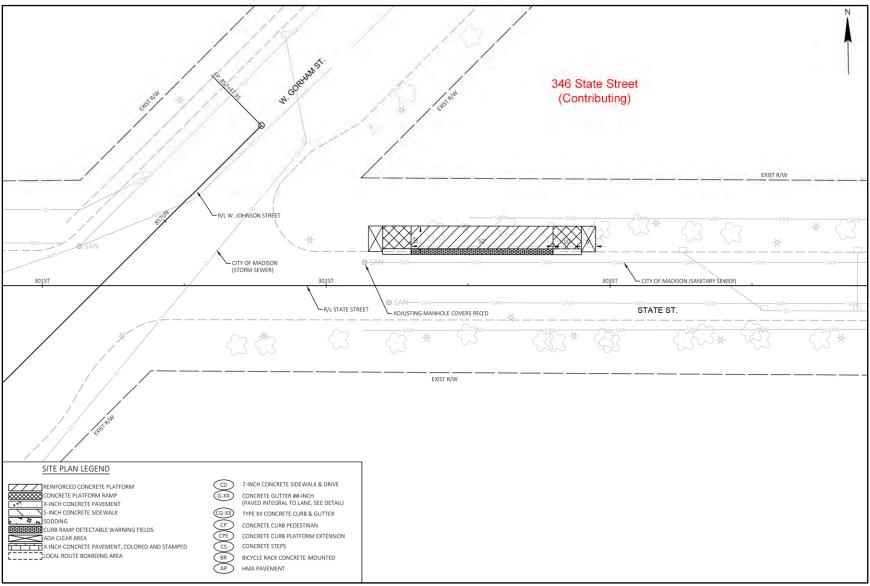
State Street at Gorham Street – Plan View of Proposed Curbside Station
